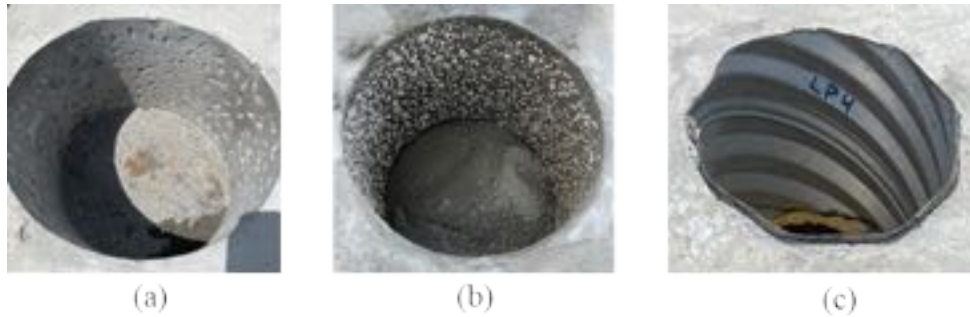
Surface finishes for larger-plug specimens: (a) electrical hammer with chisel attachment, (b) exposed aggregate finish, and (c) metal pipe left in place.
